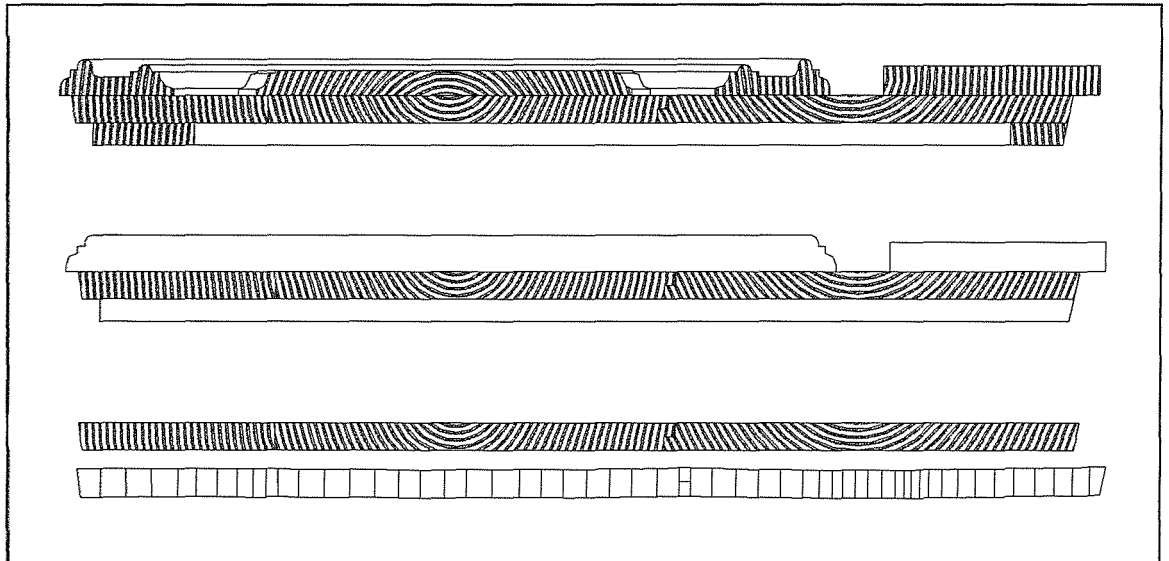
Top and centre: cross-sectional view of the sacristy door showing the frame, panel and mouldings attached to Boards 1, 2 and 3; Below: the boards before and after prediction, in this case showing expansion
